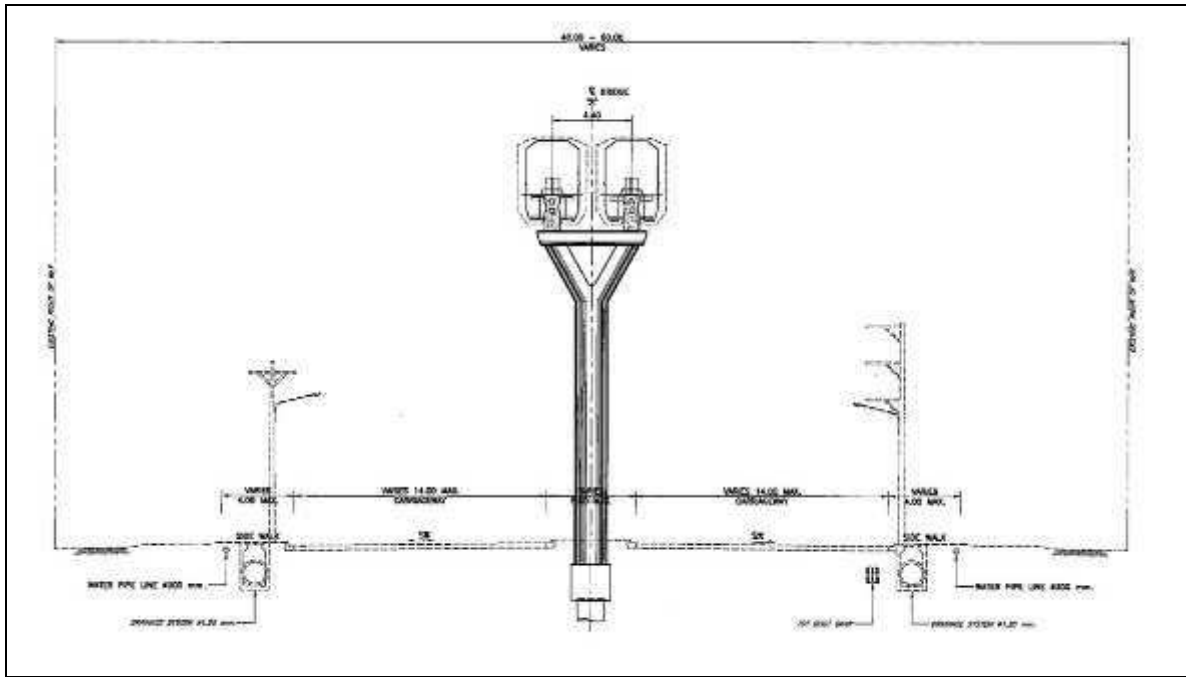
9 Cross section of road from Si Udom Intersection to Si lam Interchange,
